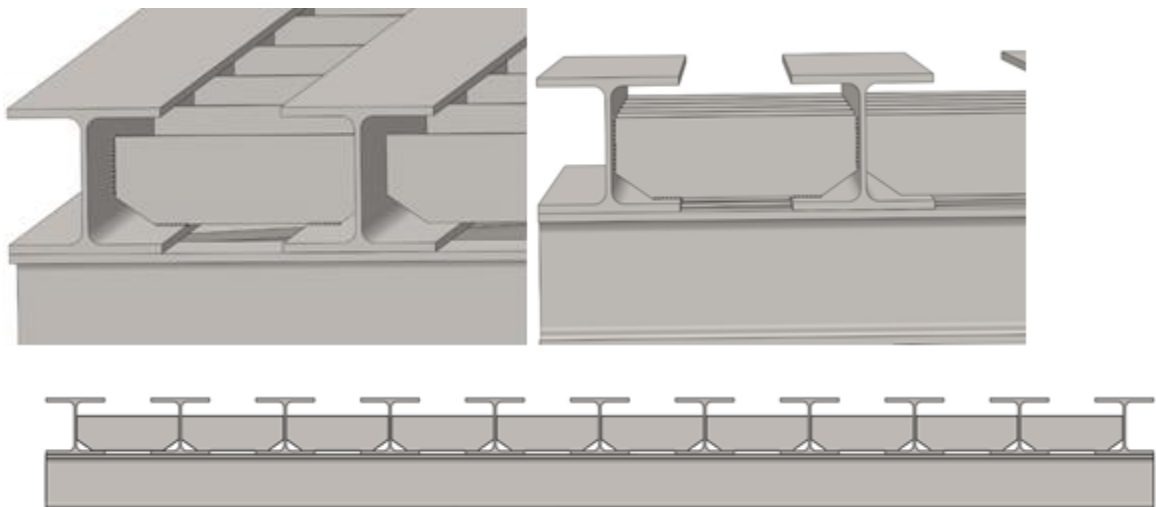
Welded gusset plates connecting the webs
